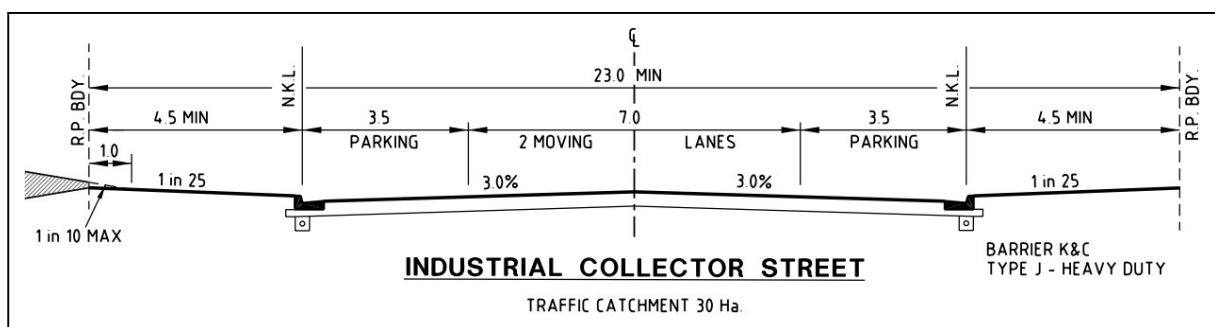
PROPOSED NEW ROAD CROSS SECTION
